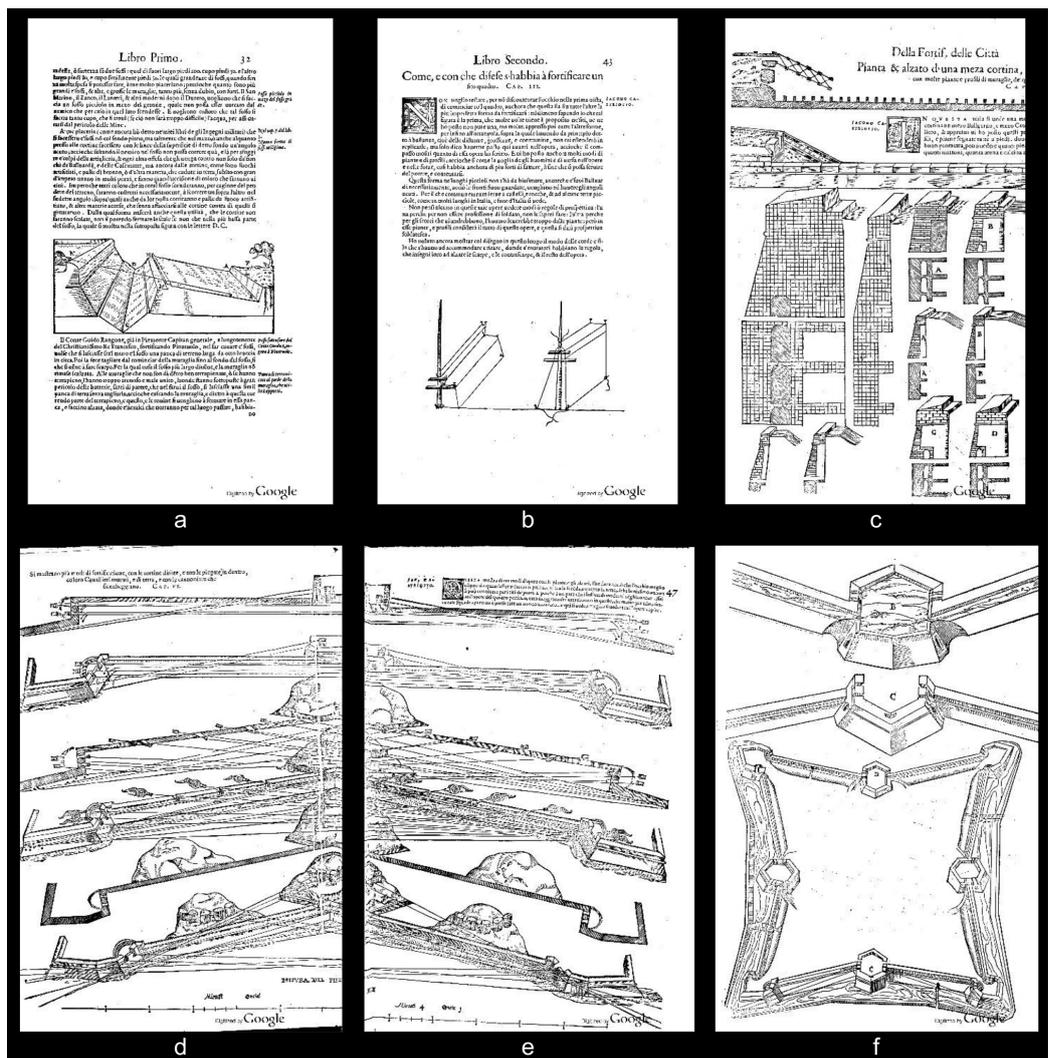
Maggi and Castriotto's representations of fortifications 1564: a) double ditch, f. 32r; b) tools for tracing the vertical sections of a curtain wall in the building site, f. 34r; c) examples of curtain walls with bastions, ff. 46v, 47r; d) and e) examples of some curtain walls with bastions, ff. 46v, 47r; f) centred knight, soldier's perspective views from the inside and the outside, f. 55v.
